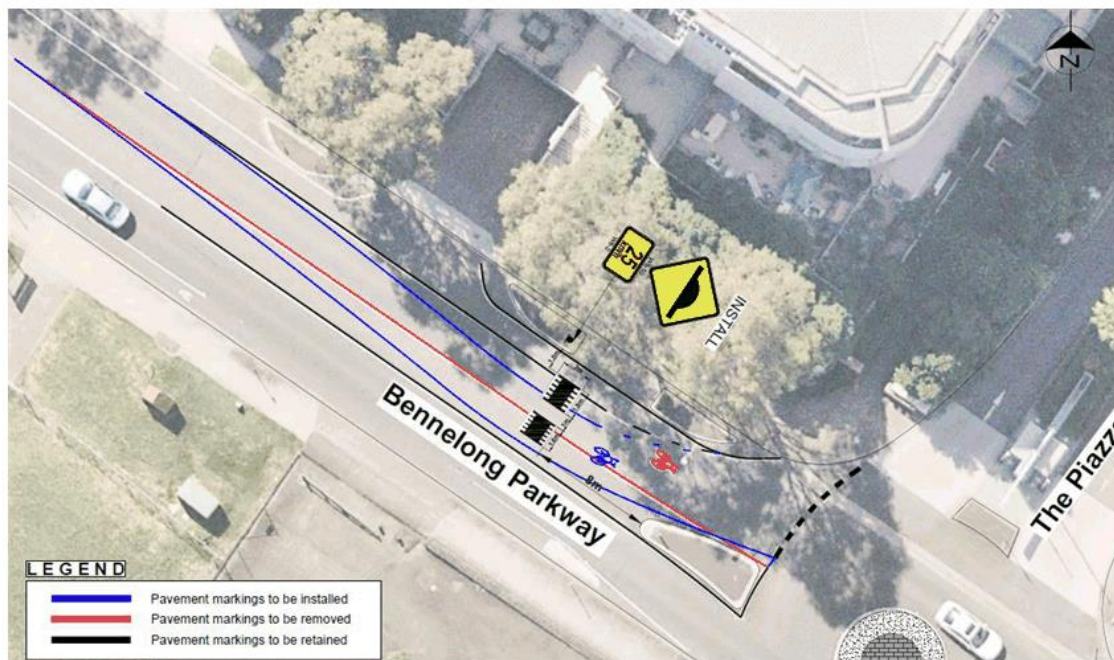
Current concept plan of the proposed traffic facilities on the eastbound approach to the roundabout in Bennelong Parkway at The Piazza, Wentworth Point
